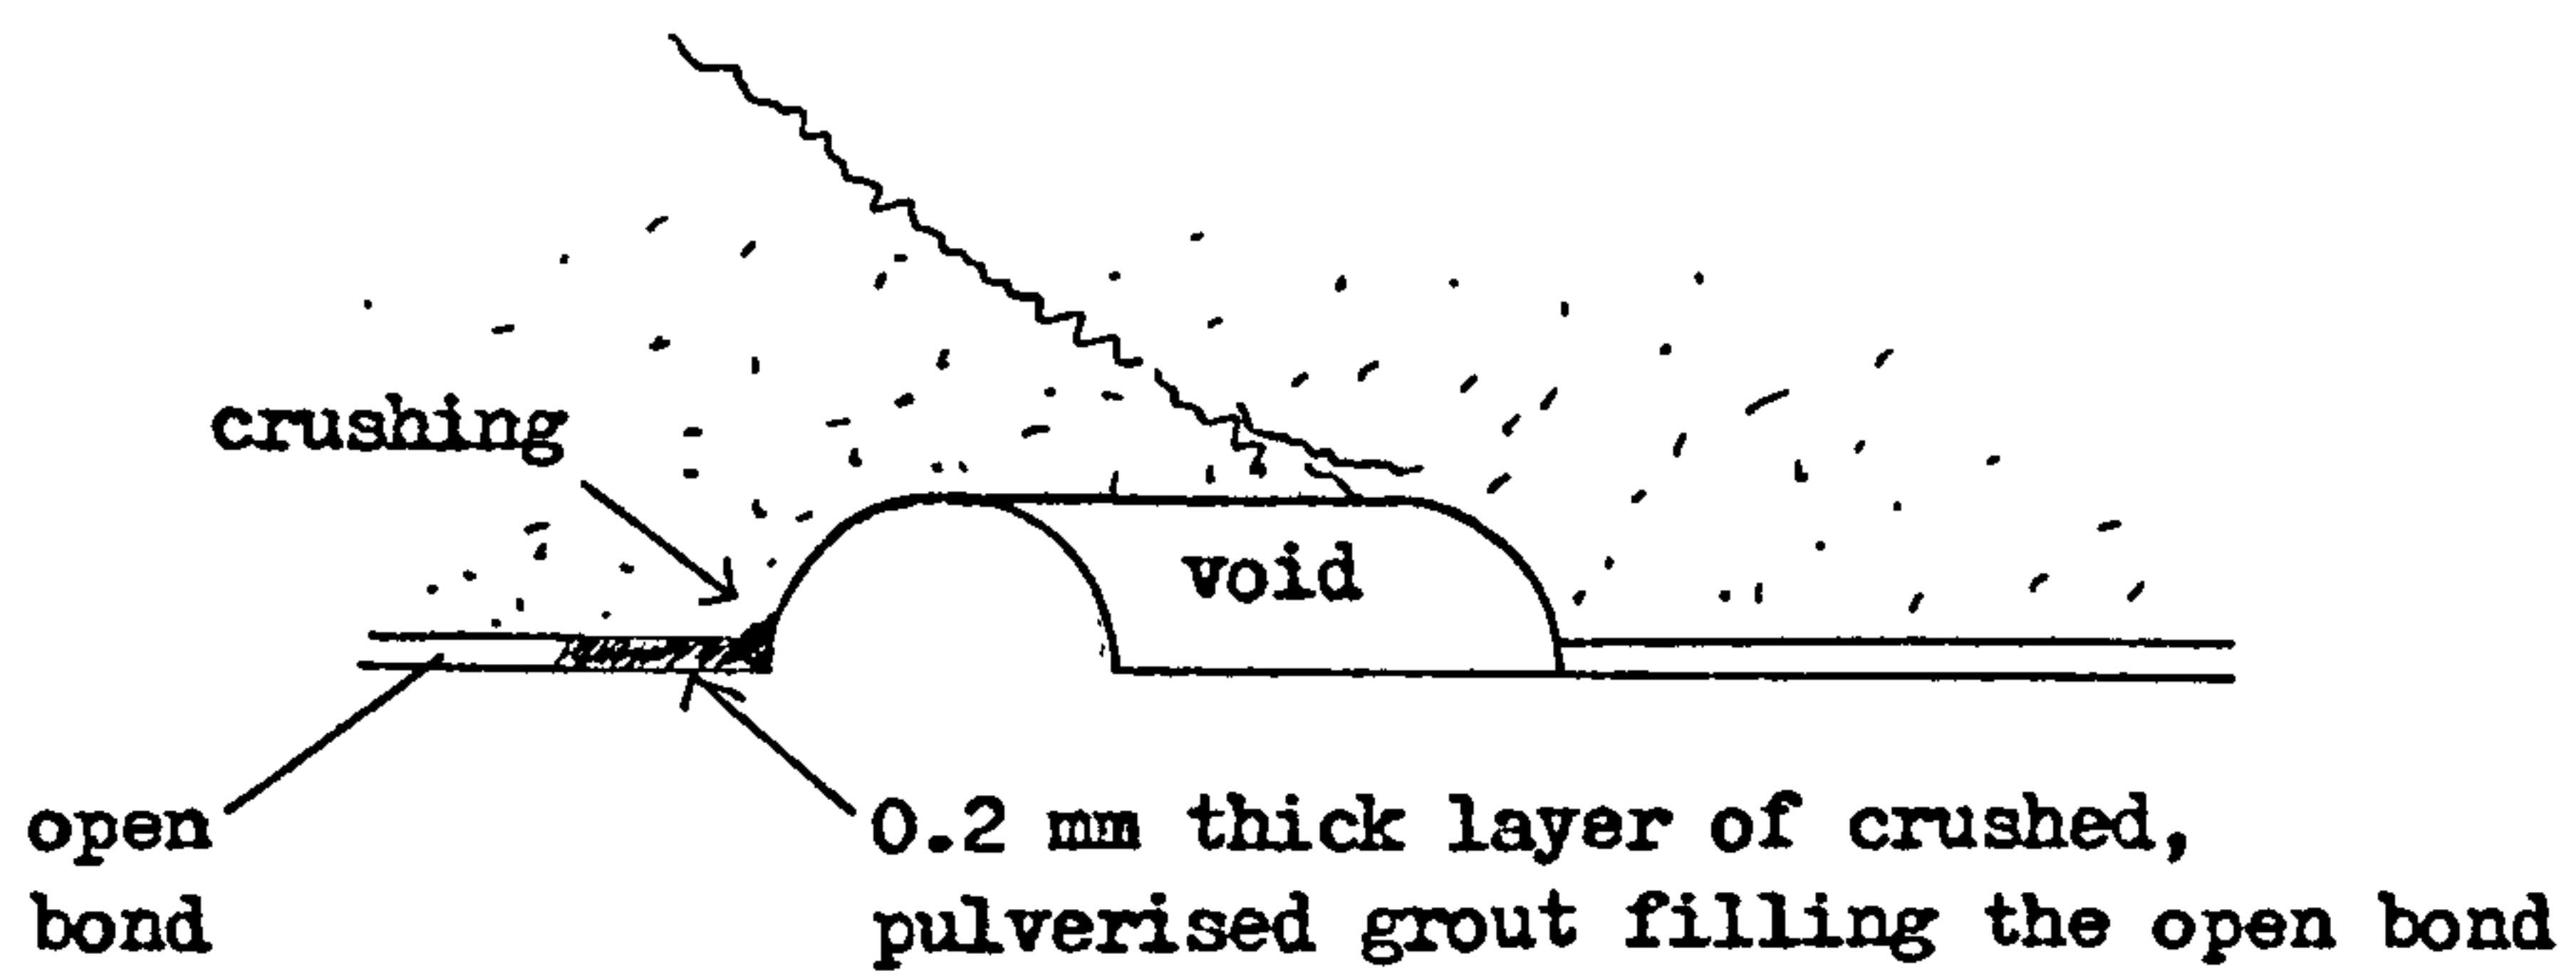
DEPOSITS OF PULVERISED GROUT FOUND TO BE FILLING THE OPEN BOND AFTER REMOVAL OF THE SLEEVE.
